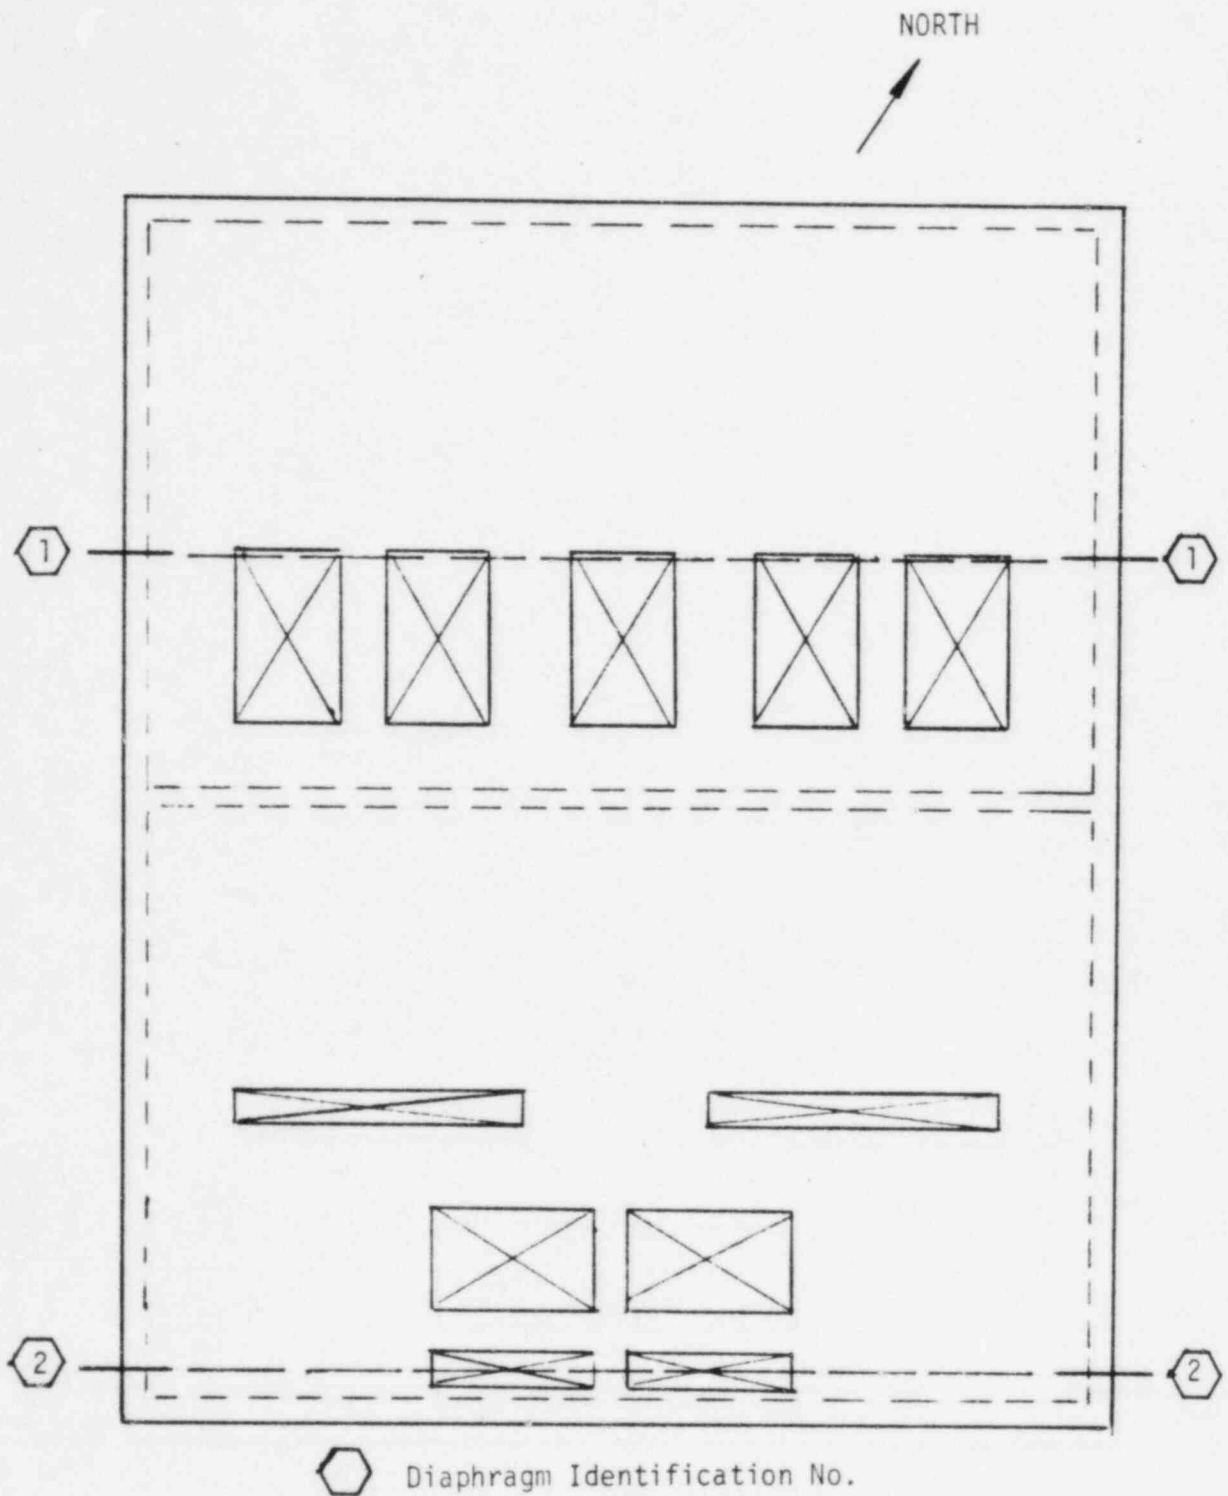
SERVICE WATER PUMP STRUCTURE ROOF
